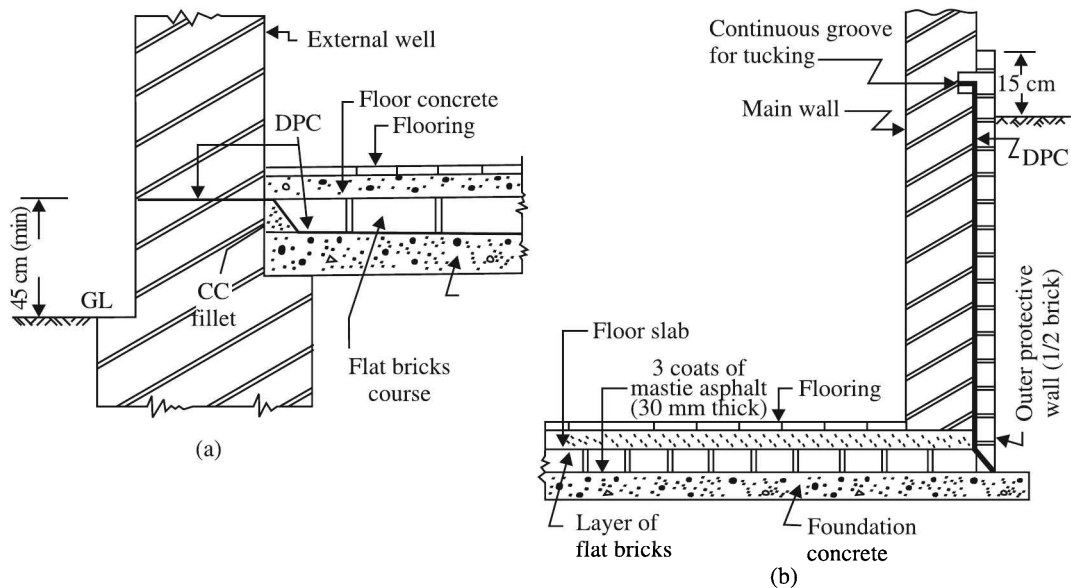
Damp-proofing for floors and tanking for basement: (a) DFC for flooring with high groundwater level (b) External asphalt tanking for basement.
